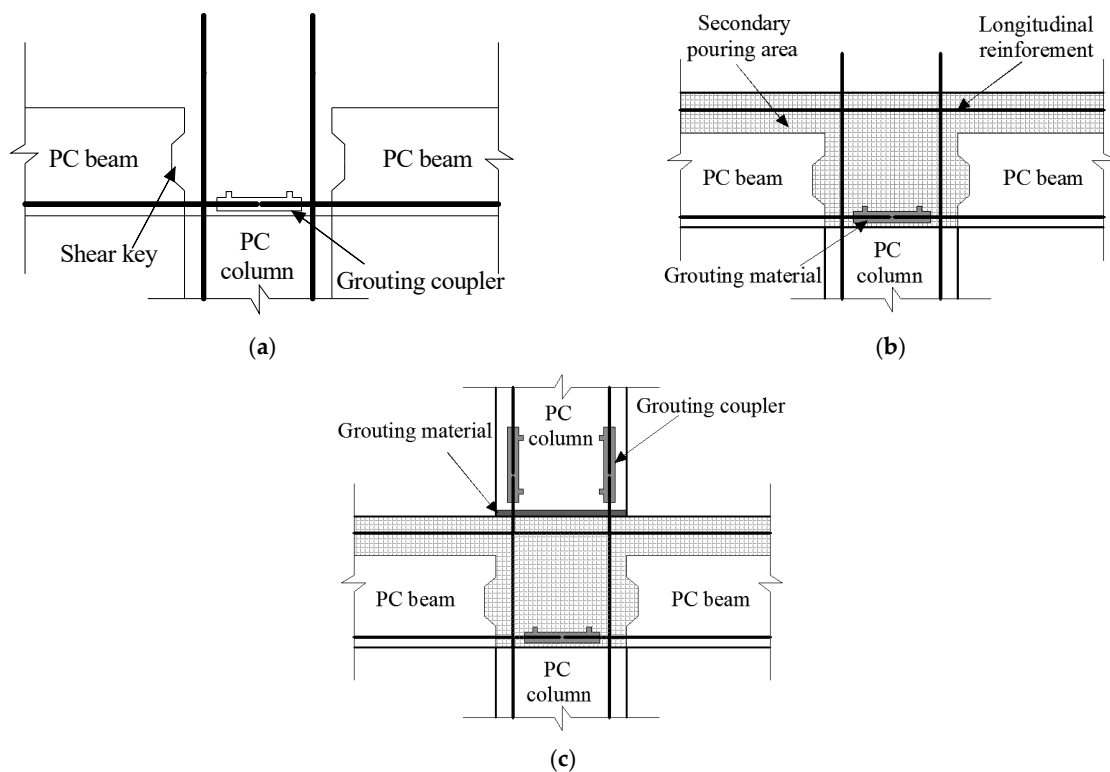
Assembly process for PC connection: (a) locations of beam and column; (b) secondary pouring; (c) grouting curing.
